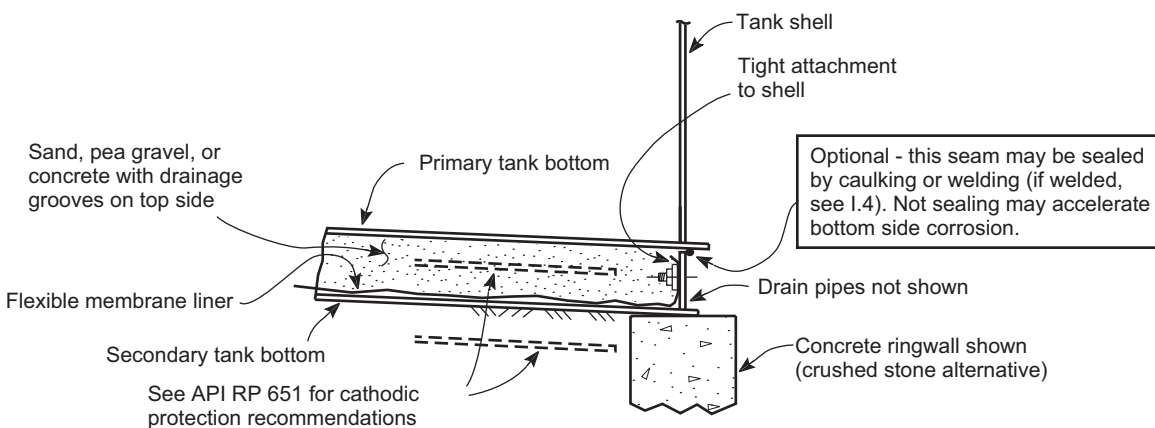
Double Steel Bottom with Leak Detection at the Tank Perimeter (Typical Arrangement)
